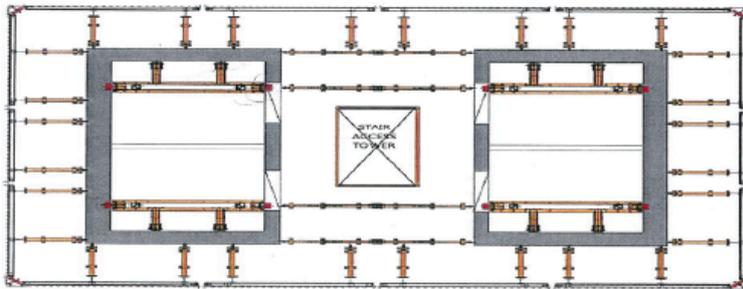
PLAN VIEW OF PATFORM-3 GRID WORK LAYOUT
